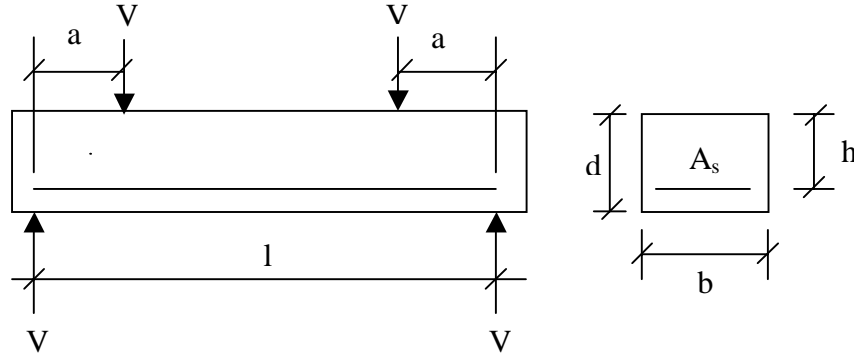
Details of Cross Section for Shear Strength Evaluation
